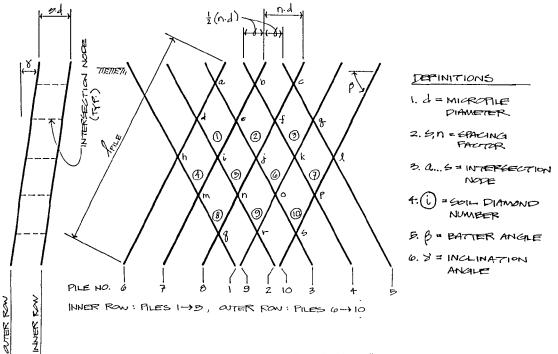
10-Pile Reticulated Test Wall: "Quilted System"
